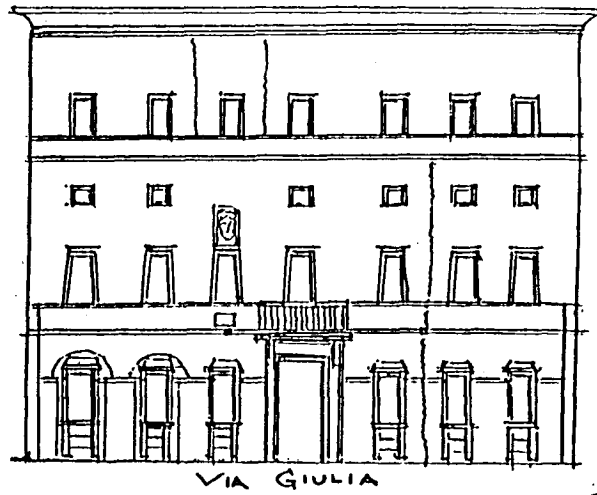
Palazzo Sacchetti: street elevations (from Andres)
